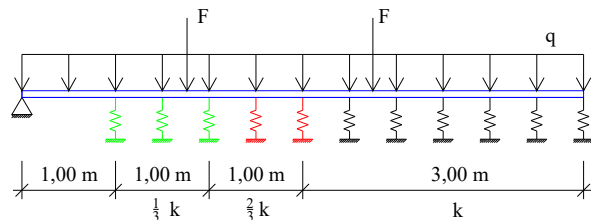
The model of bridge approaching slab under given embankment settlement [8]
